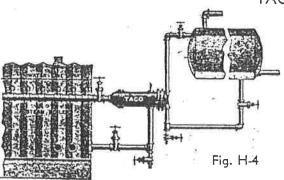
Taco Nos. 4, 5 or 6 installed entirely below the water line of a steam heating boiler using boiler water as the heating medium. This method of installation and type of Taco Heater are especially adaptable to low water line boilers.
